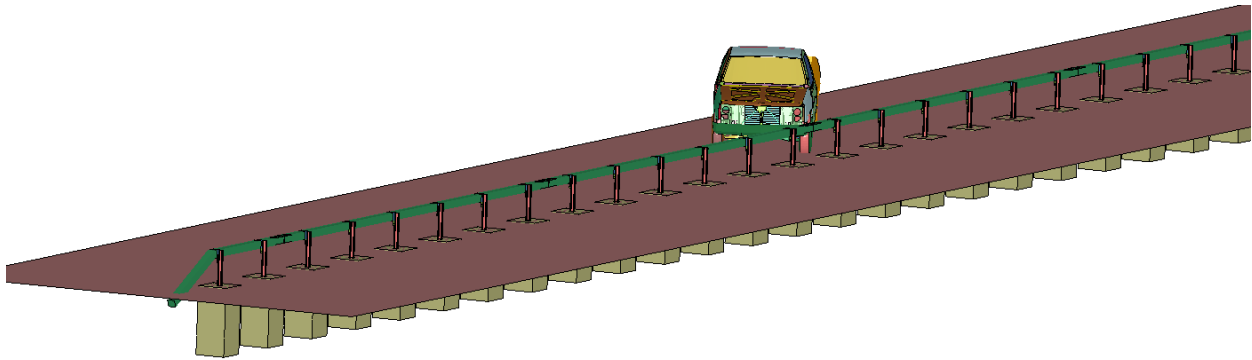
Finite Element Model for the Box Beam Guardrail System.
